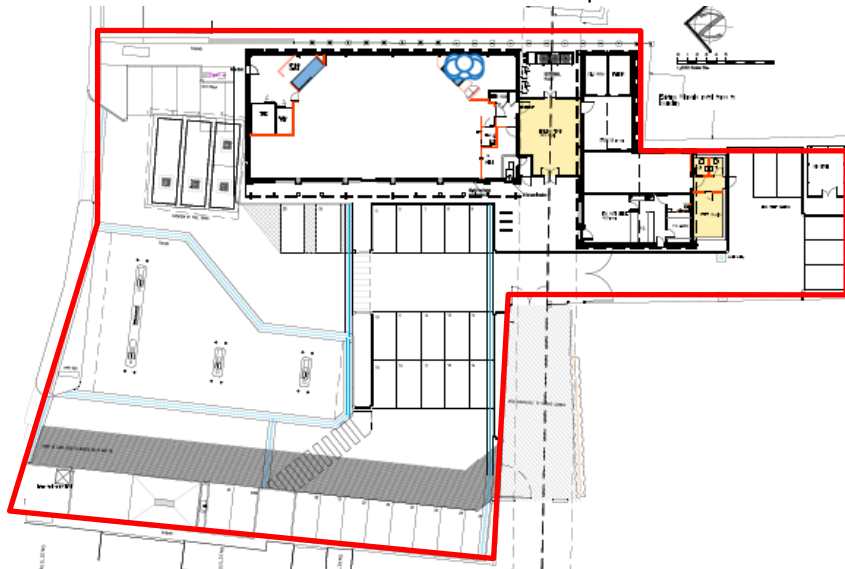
Proposed site layout plan showing site of extensions in yellow and site boundary
